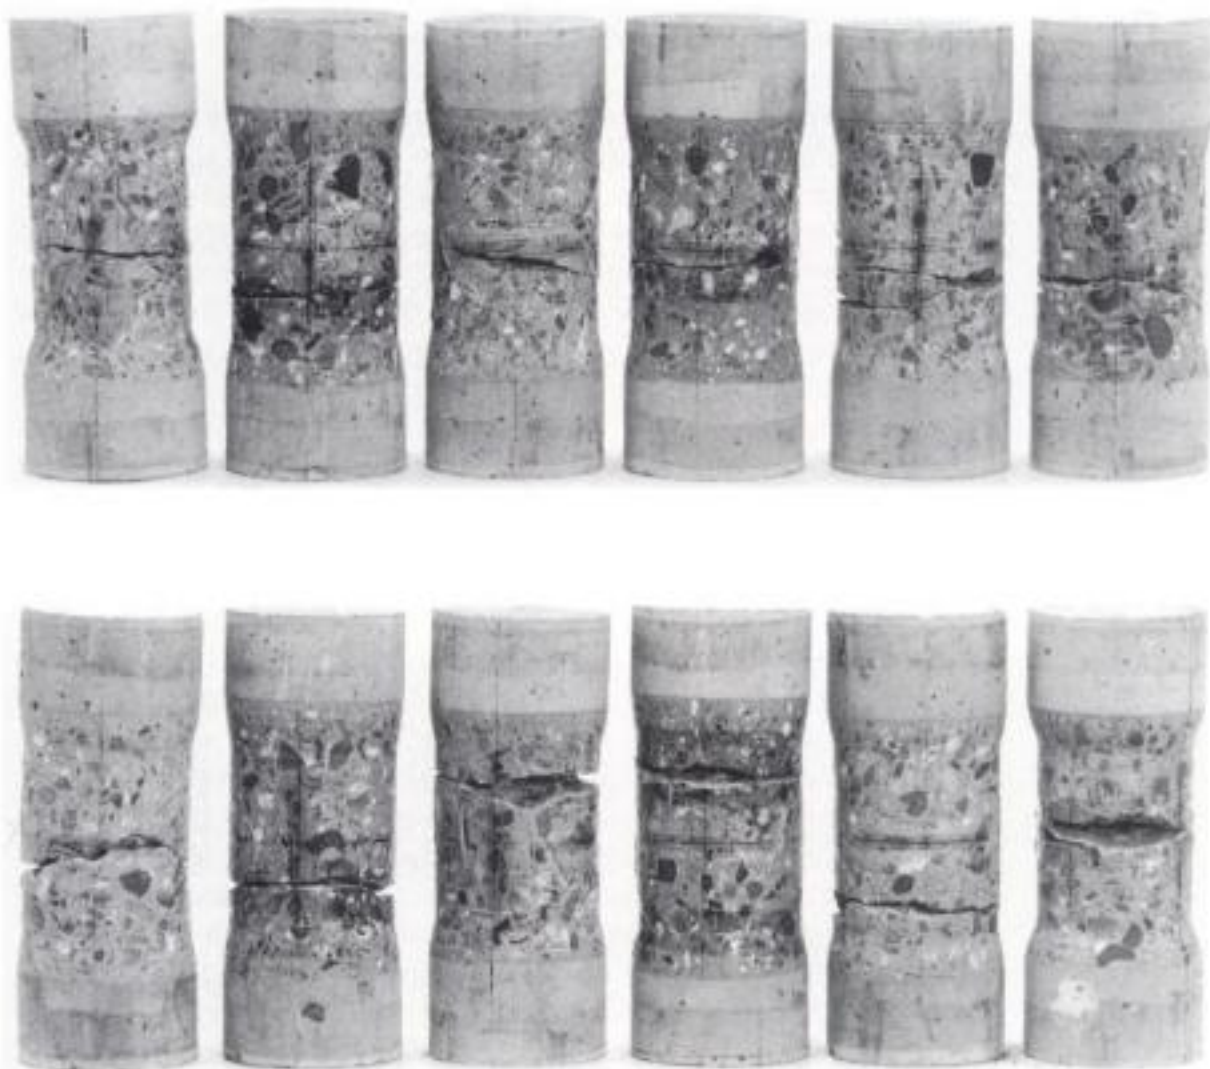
Typical concrete specimens (for a given mix) after failure under triaxial 'extension' and C-C-T (all standard-size cylinders 10 in \times 4 in/25.4 cm \times 10.2 cm)²⁰
